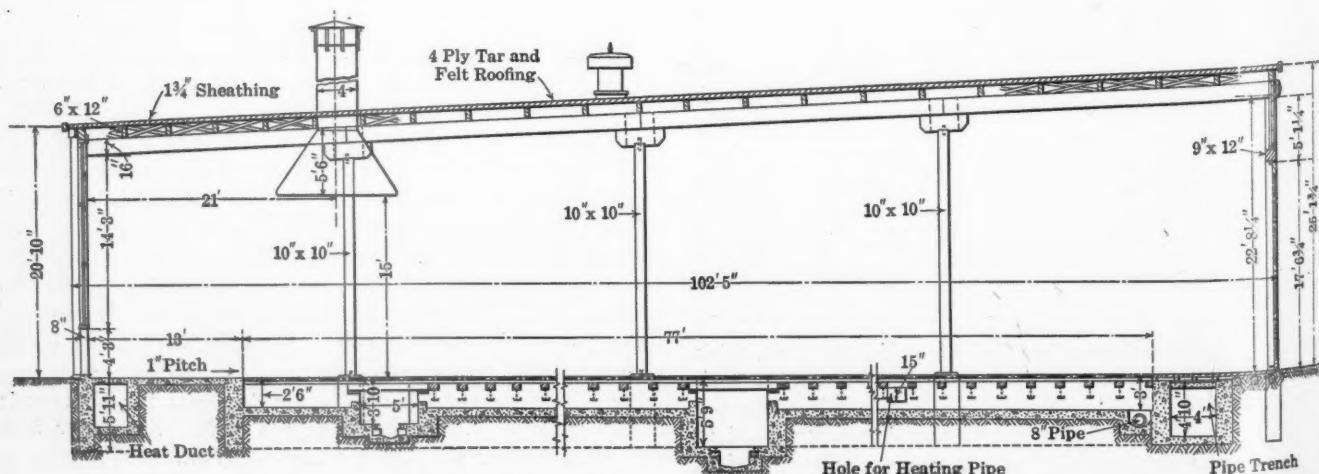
DETAILS OF PITS, SHOWING JACKING PIT AT OUTER END.
